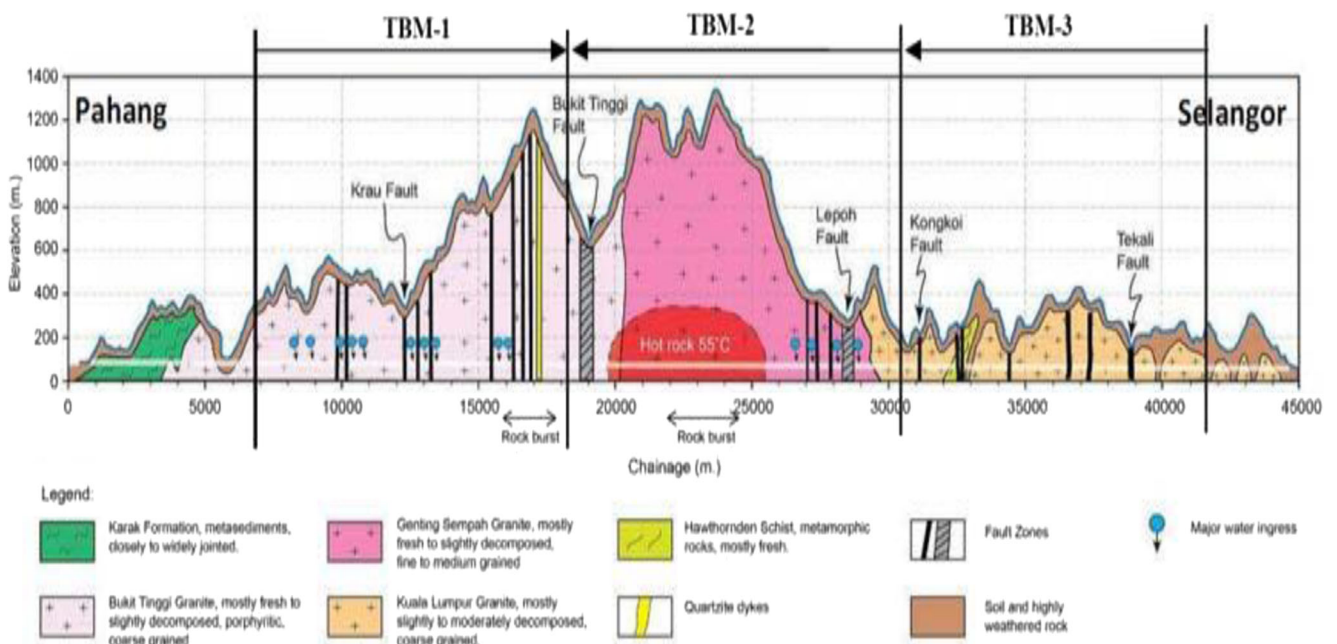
Geological profiles along tunnel and TBM excavation location (Kawata et al. 2014)
